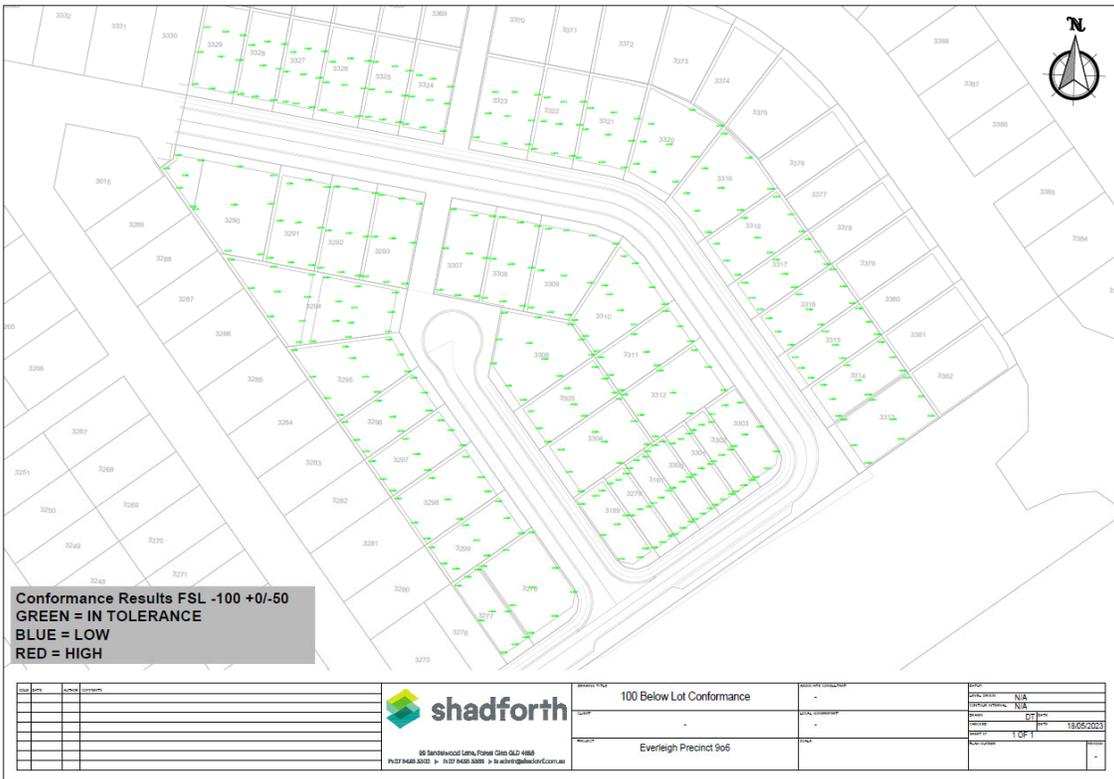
Actual Constructed Area of Fill (100mm BFSL) – Shadforth Survey Plans
